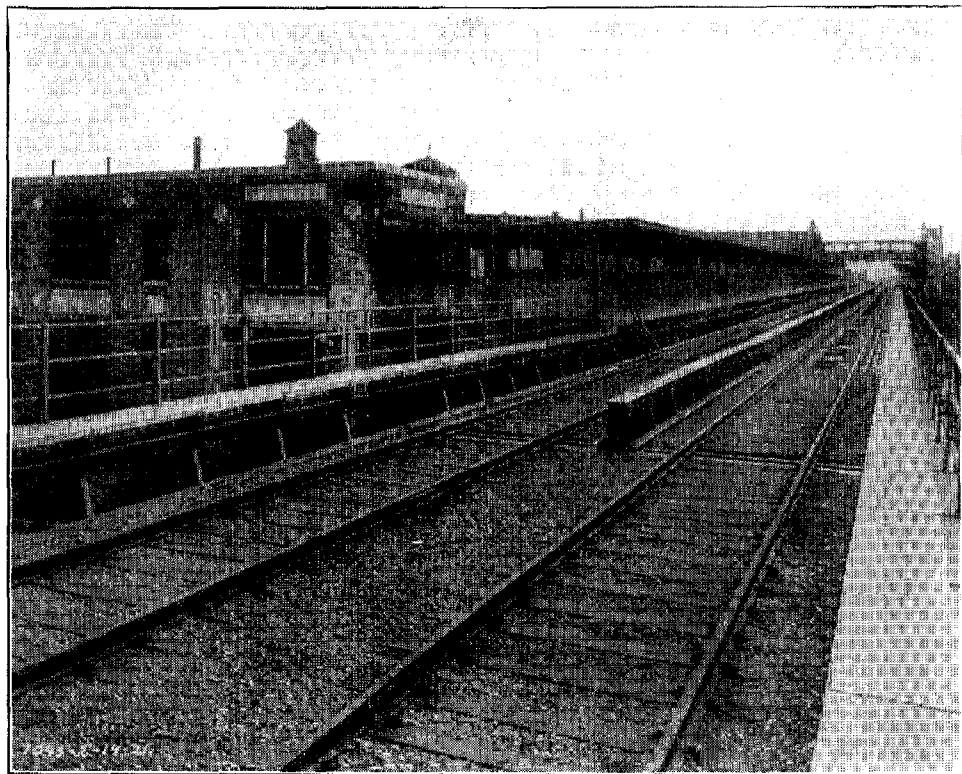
Ballasted deck construction on the Frankford Elevated Railway in Philadelphia.
